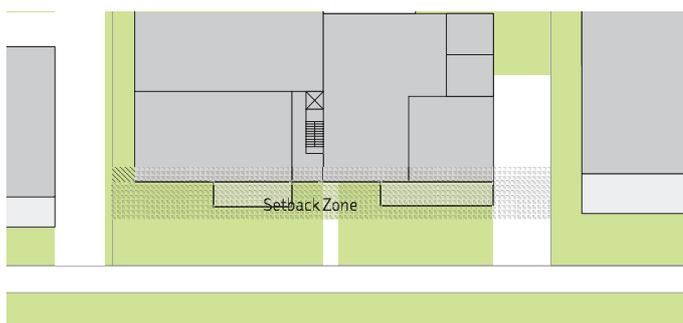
DIAGRAM 8: FRONT OF BUILDING TO BE BUILT WITHIN THE MINIMUM AND MAXIMUM STREET SETBACK ZONE.
